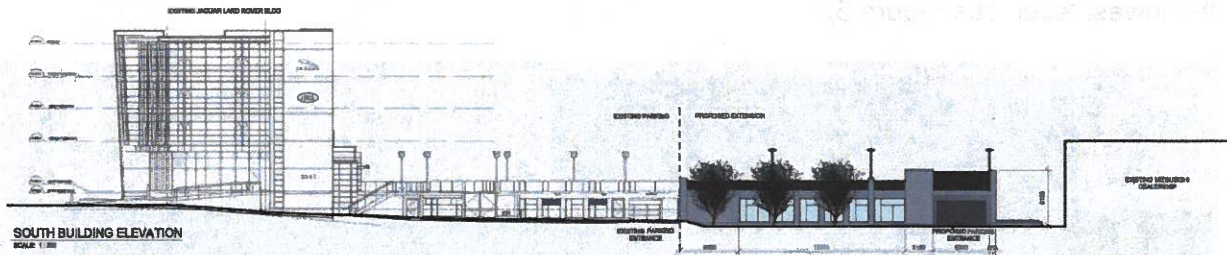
Streetscape Elevation from Audley Street (from Plans by collabor8 Architecture + Design Inc.)
